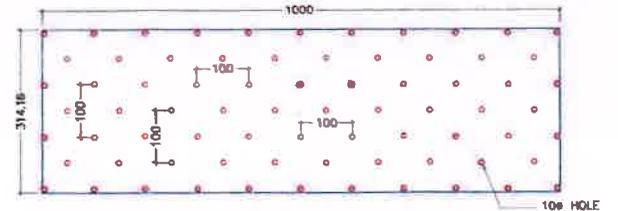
DETAIL OF STANDARD HDPE PIPE ROOT (TYP.)
